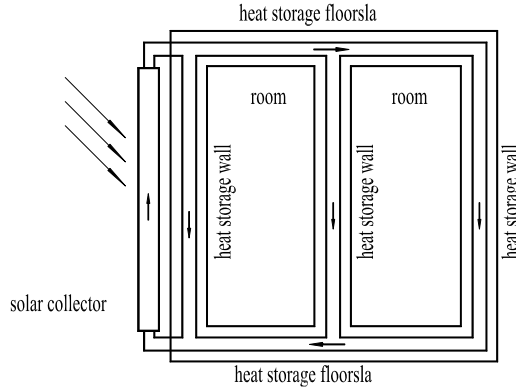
The heat storage walls (floorslabs) and Solar collector installed in the same layer
